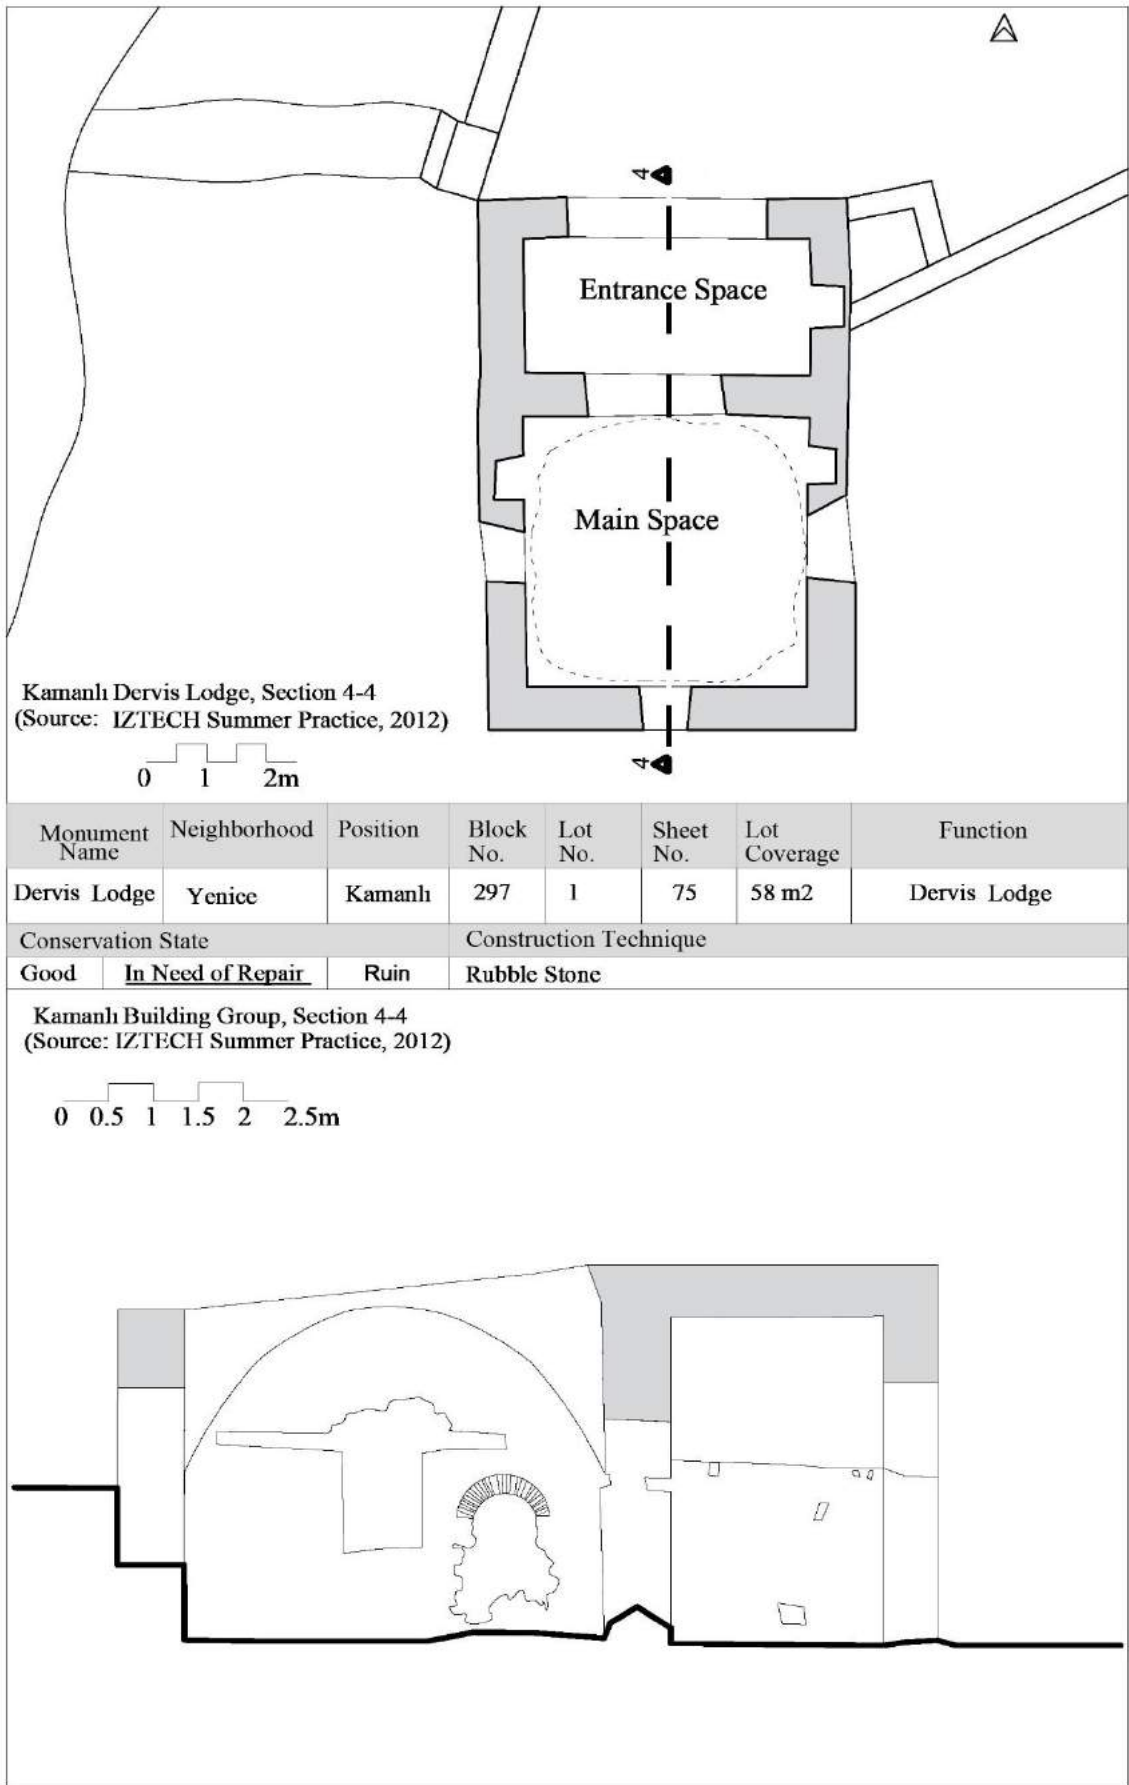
Ground floor plan and section, Kamanlı Dervish Lodge
